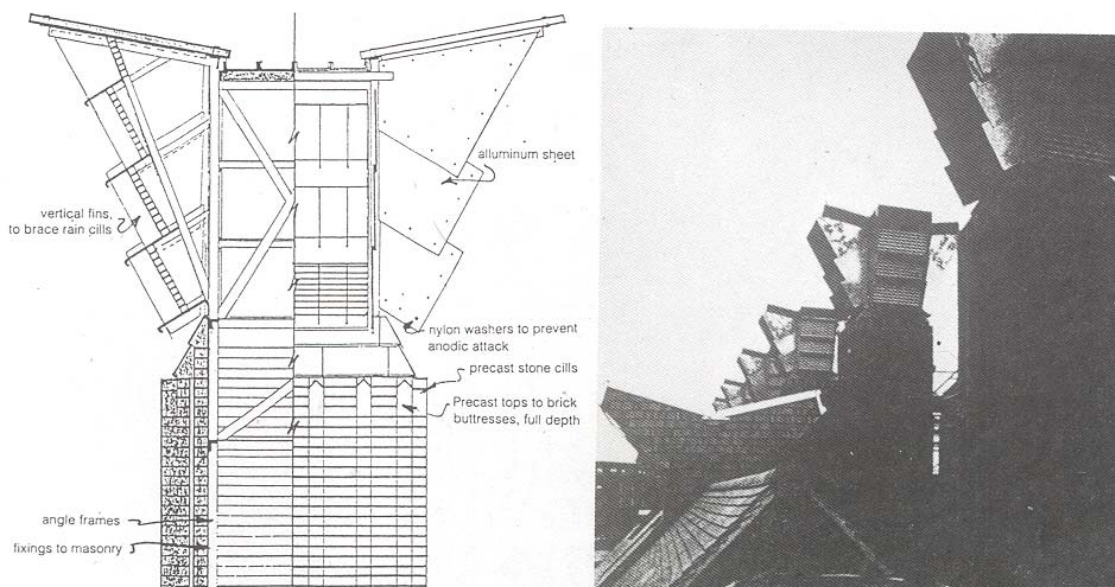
Air duct, School of Engineering, Leicester, UK (Architects: Short Ford & Associates)
